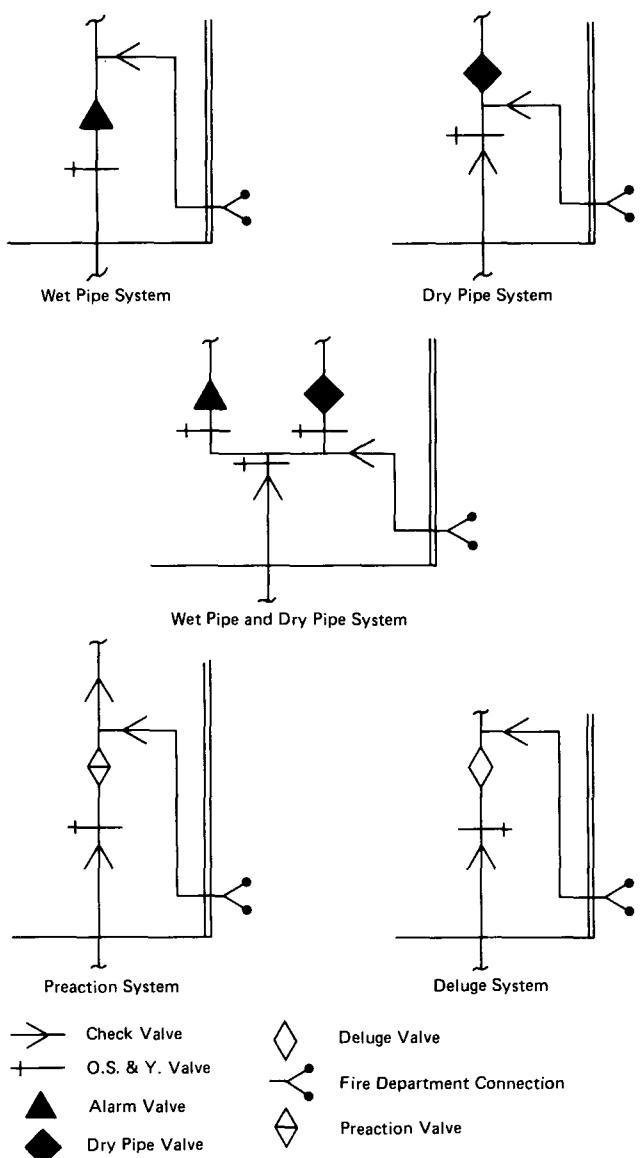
Examples of acceptable valve arrangements.
